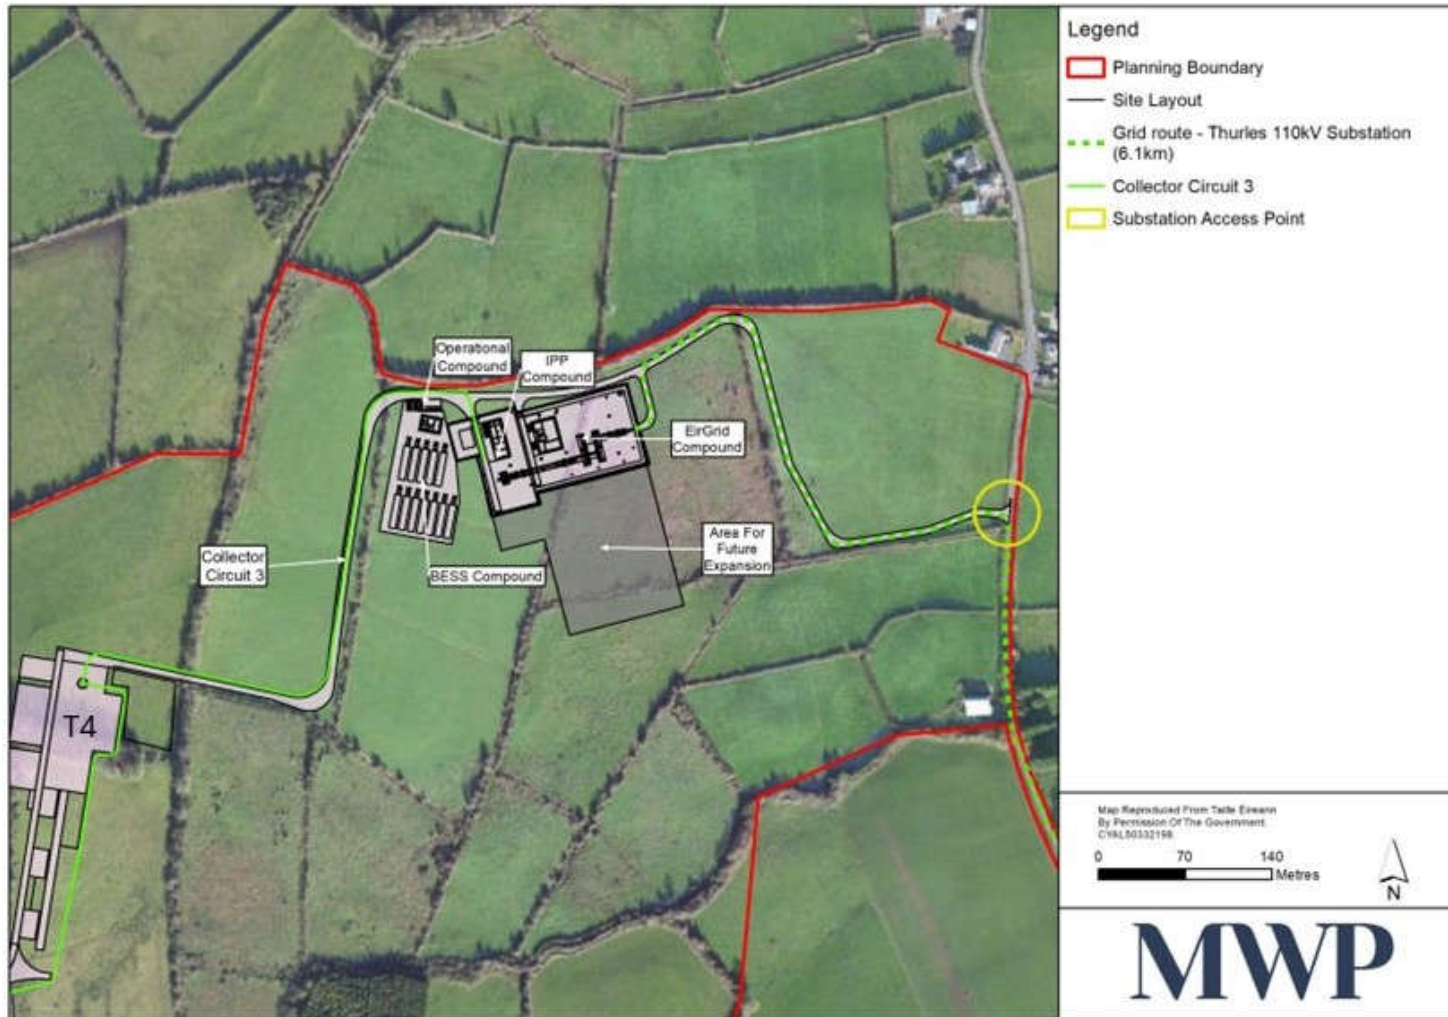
Brittas Sub-station layout with connection to T4 and connection to existing roads.
